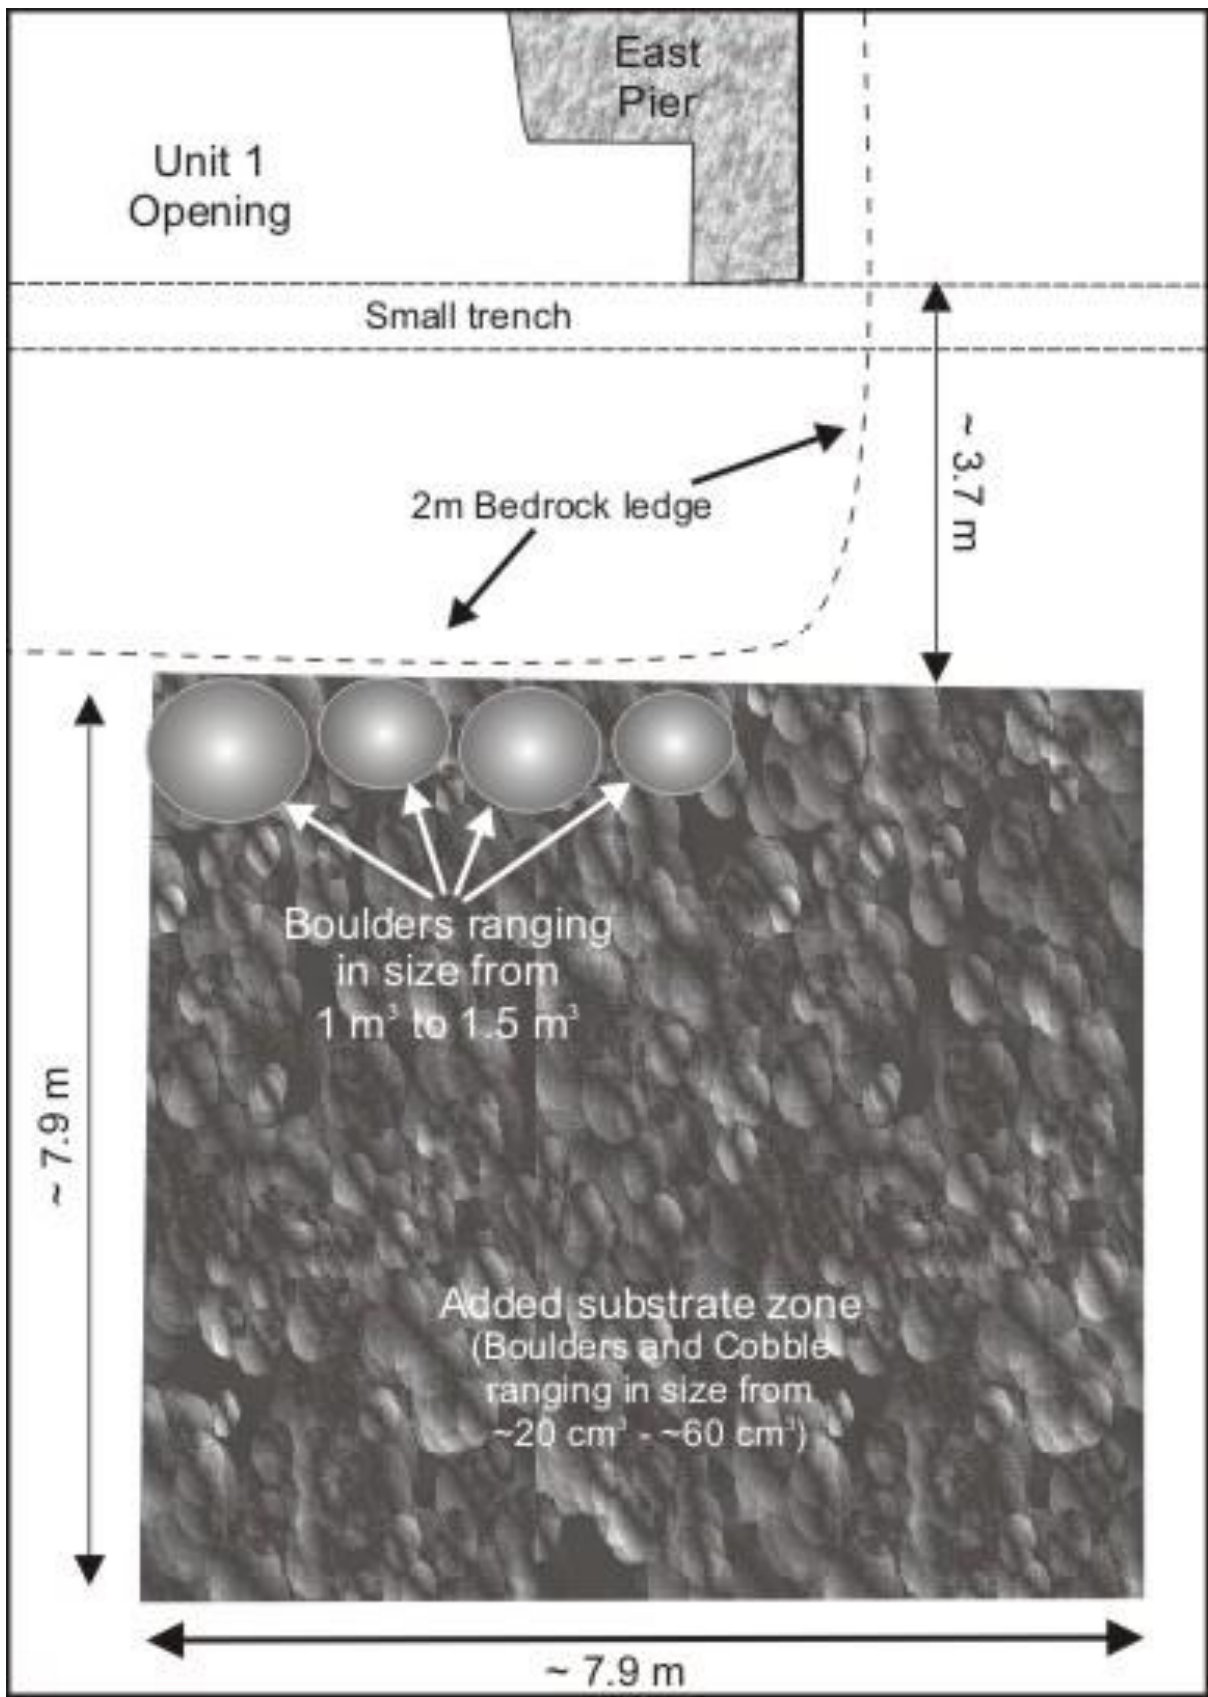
Plan view sketch of shoal constructed below Unit 1 (not to scale).
